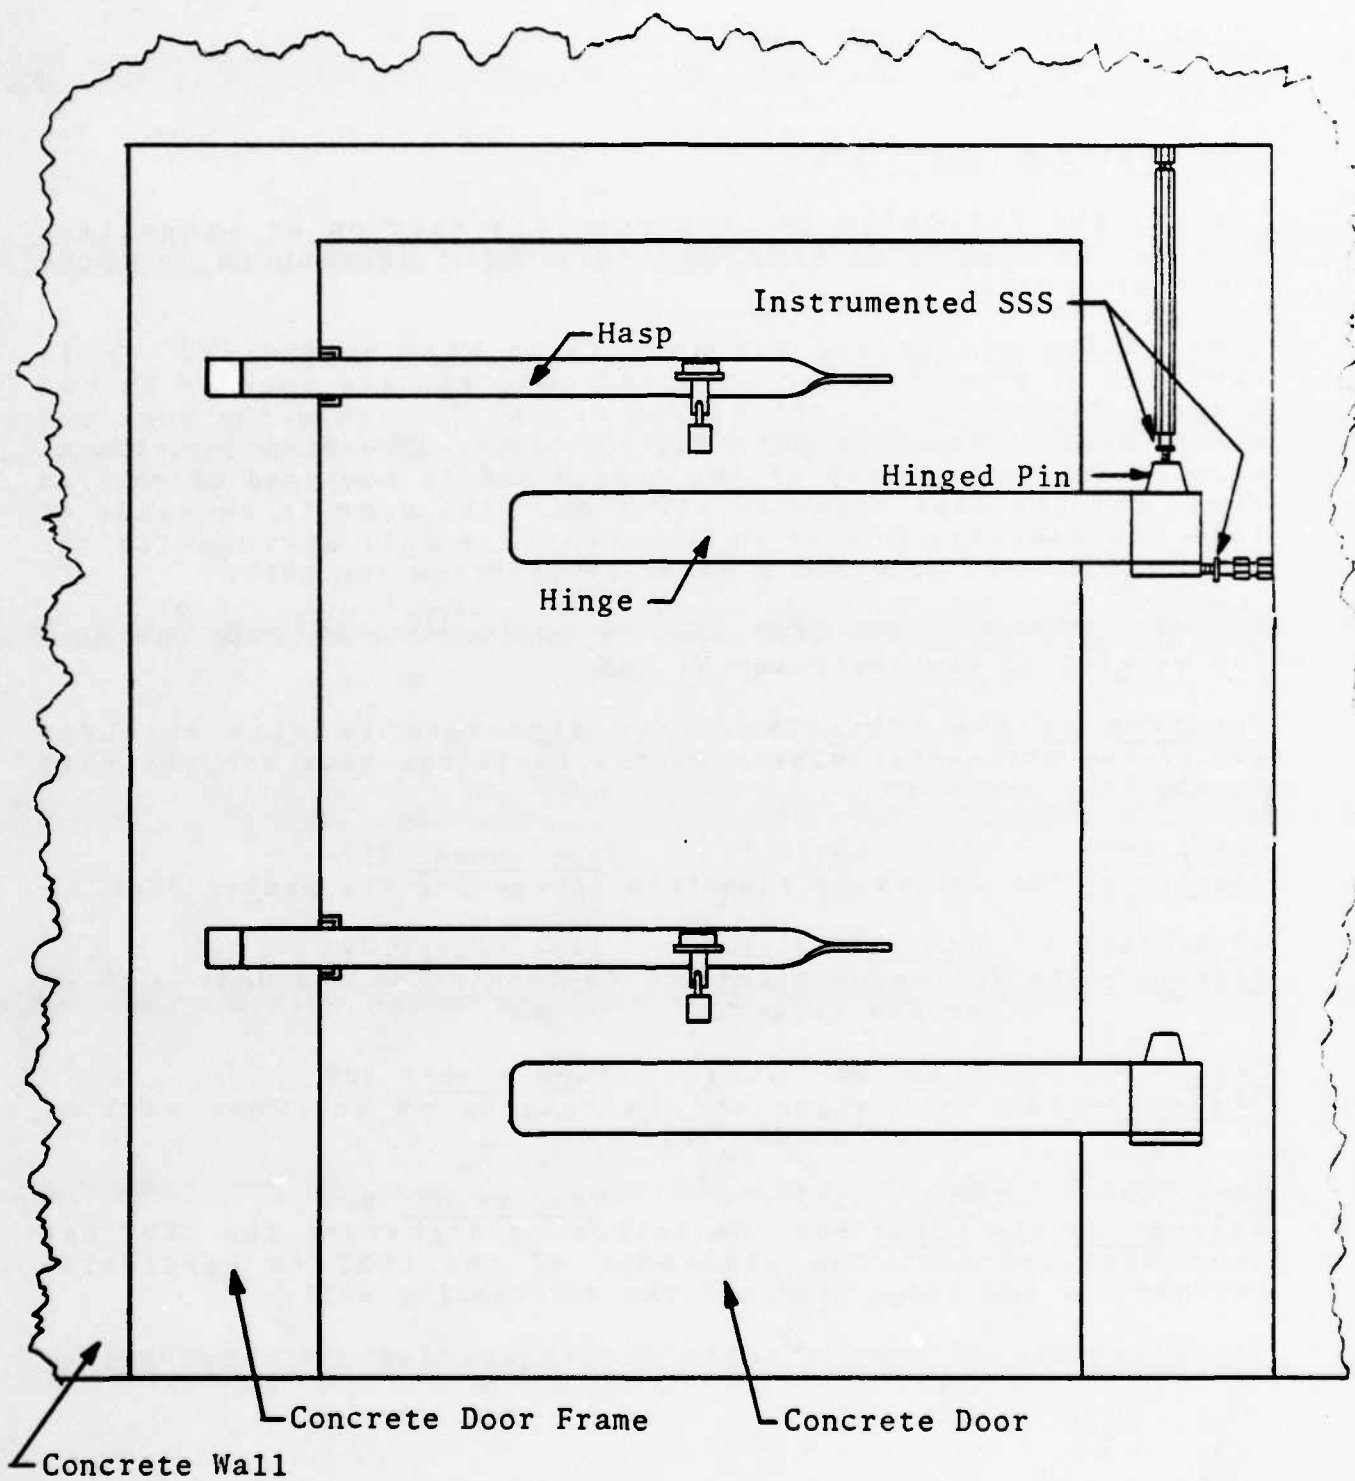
Installation of Instrumented SSS's for Signatures of a Concrete Bunker Door
